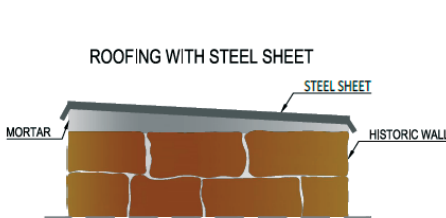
Roofing of a steel sheet with a layer of molding inclination. / Roofing with steel sheet / Steel sheet / Historic wall/ Mortar/
